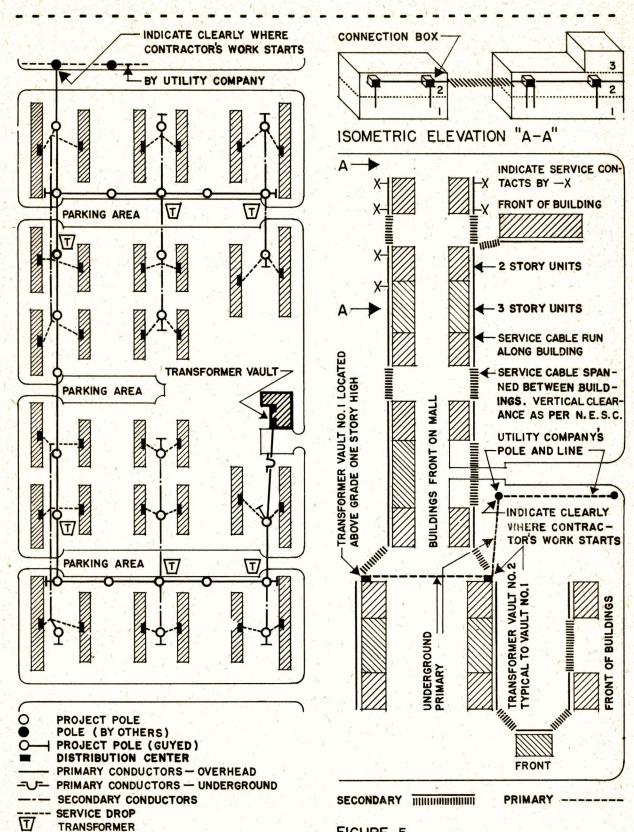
SAMPLE PLAN OF DISTRIBUTION SYSTEM WITH CABLE SUPPORTED ON BUILDINGS.
